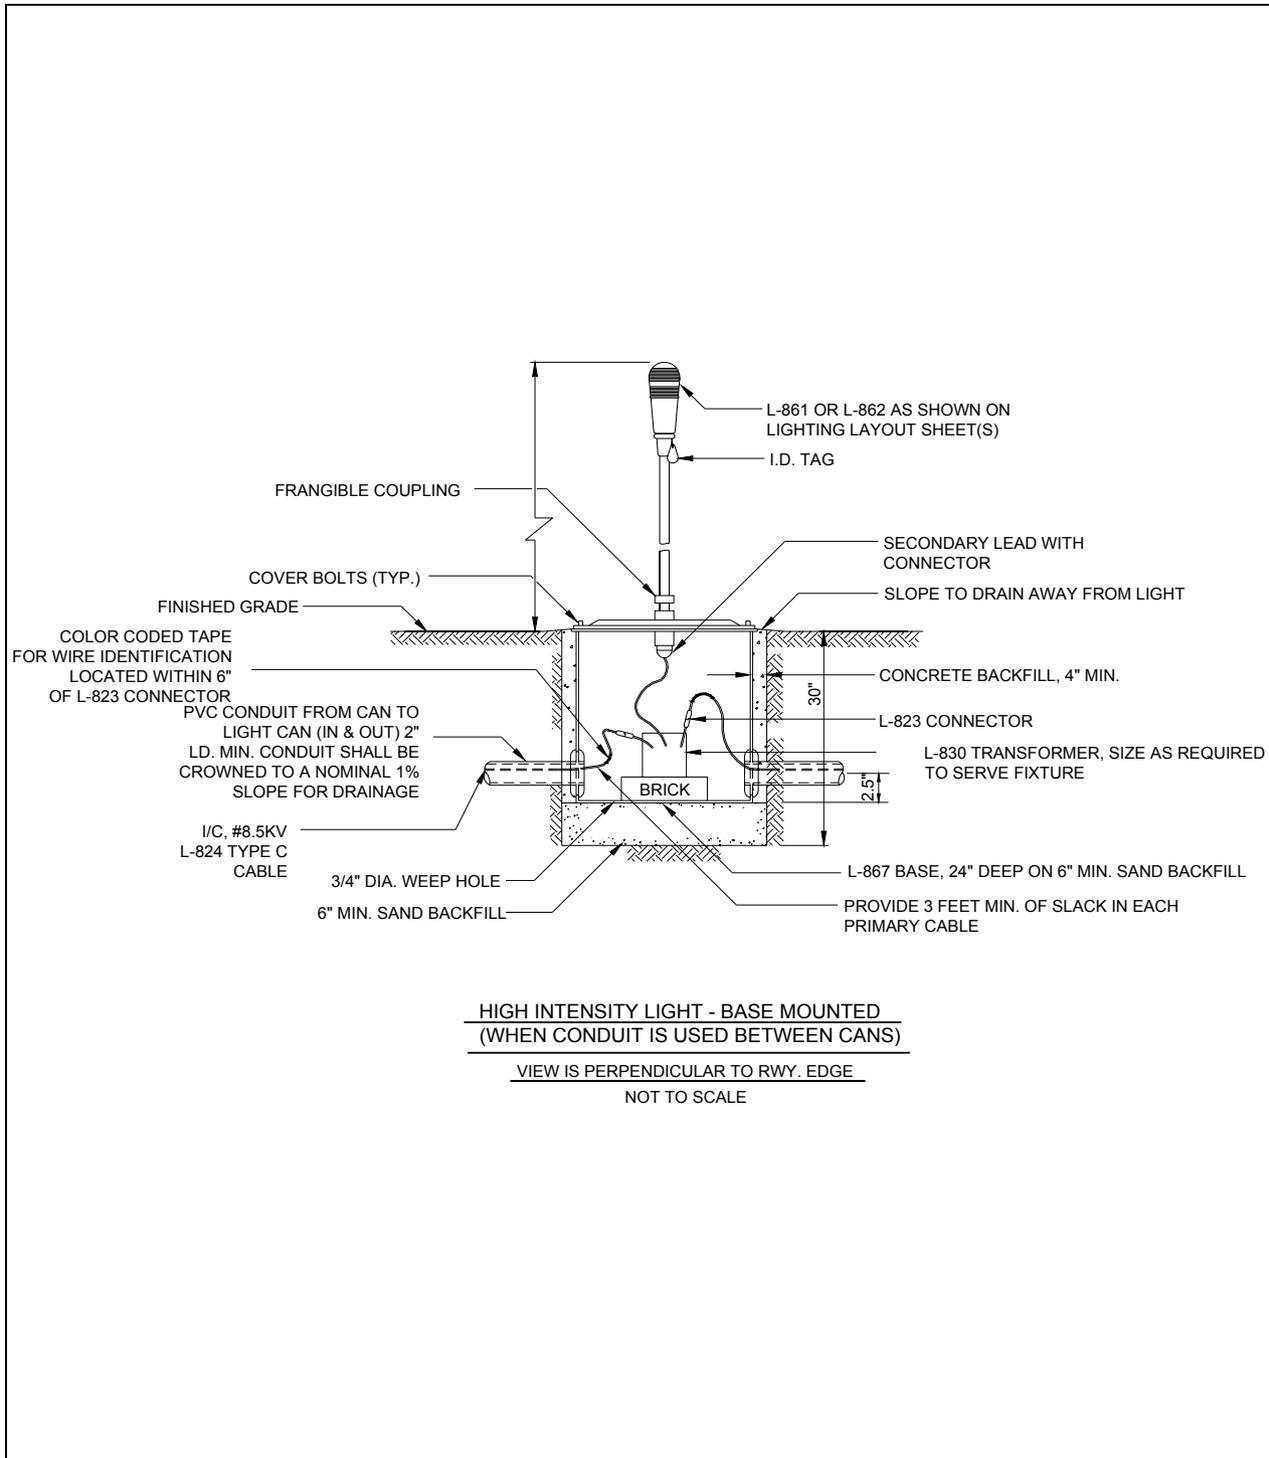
Typical Standard Details for Runway & Taxiway Edge Lights –High Intensity Light – Non-adjustable Base-mounted
